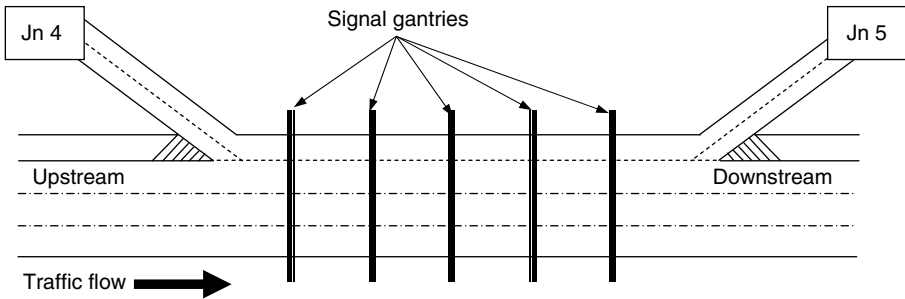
Schematic plan of an ATM pilot project Link sub-divided into four sections.
